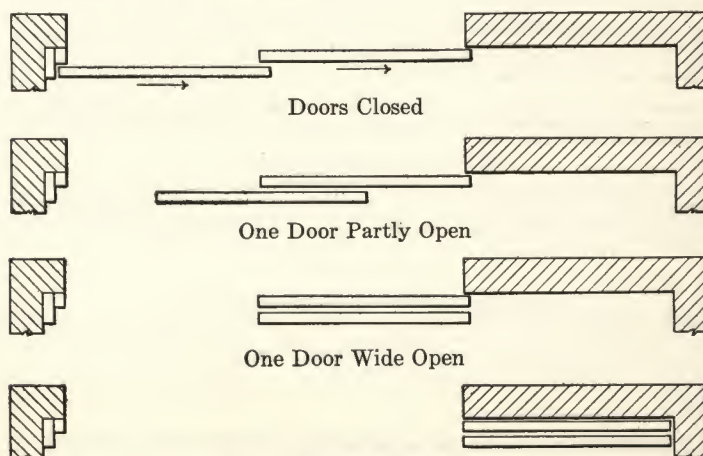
Plan showing how head jamb is built out to meet the doors mounted on the track farthest from the wall
